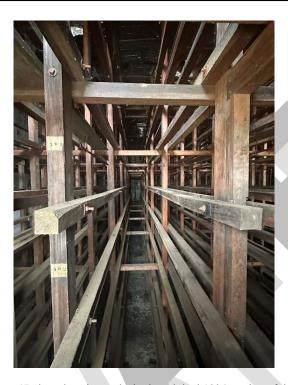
Interior view of Bonded Warehouse 1B, barrel ageing racks in the original 1934 section of the building (Volume A), camera facing east (November 17, 2023).
